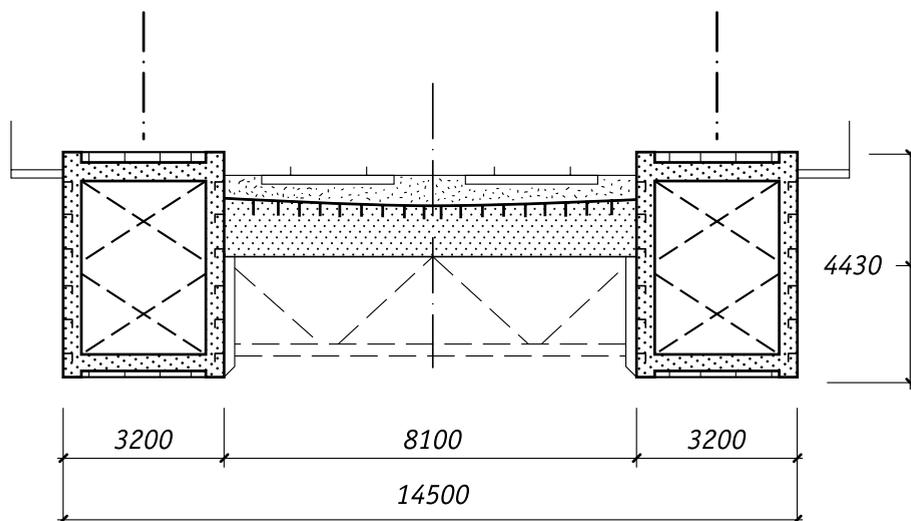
Cross-section of stiffening girder on the Railway Bridge across the Sava River in Belgrade
